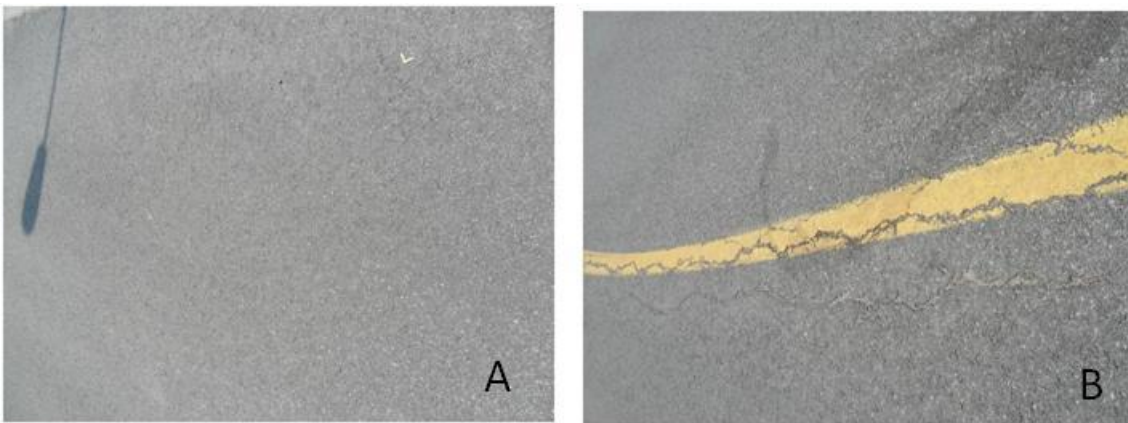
Site 3 – Slight Pop-outs (A) and Centreline Cracking (B)
